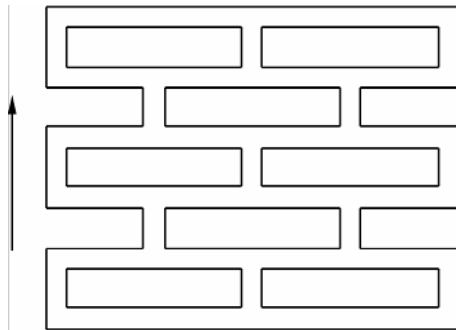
Lightweight concrete masonry units — Geometry 1,7/1,2
